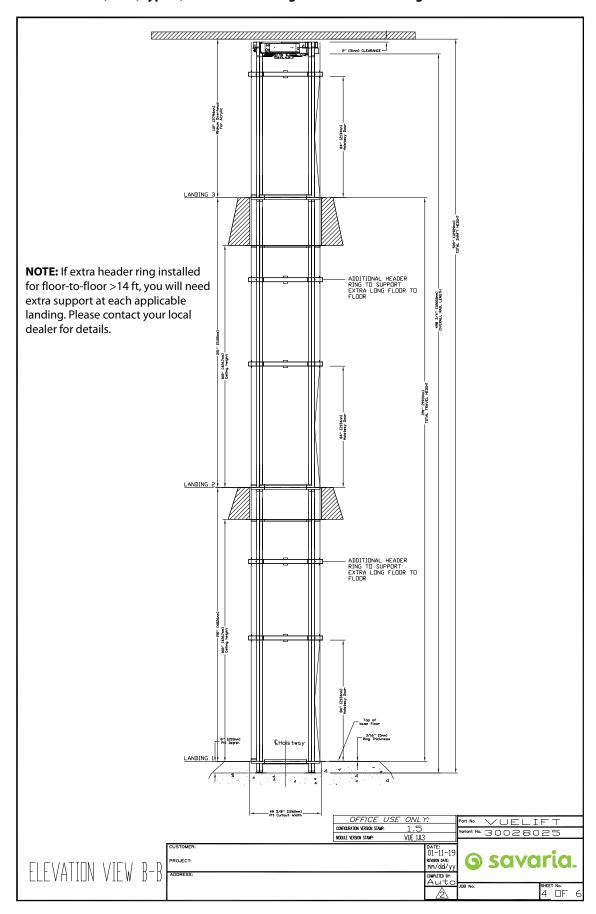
Elevation view (OGM, type 1) - extra header rings if floor-to-floor height > 14 ft
